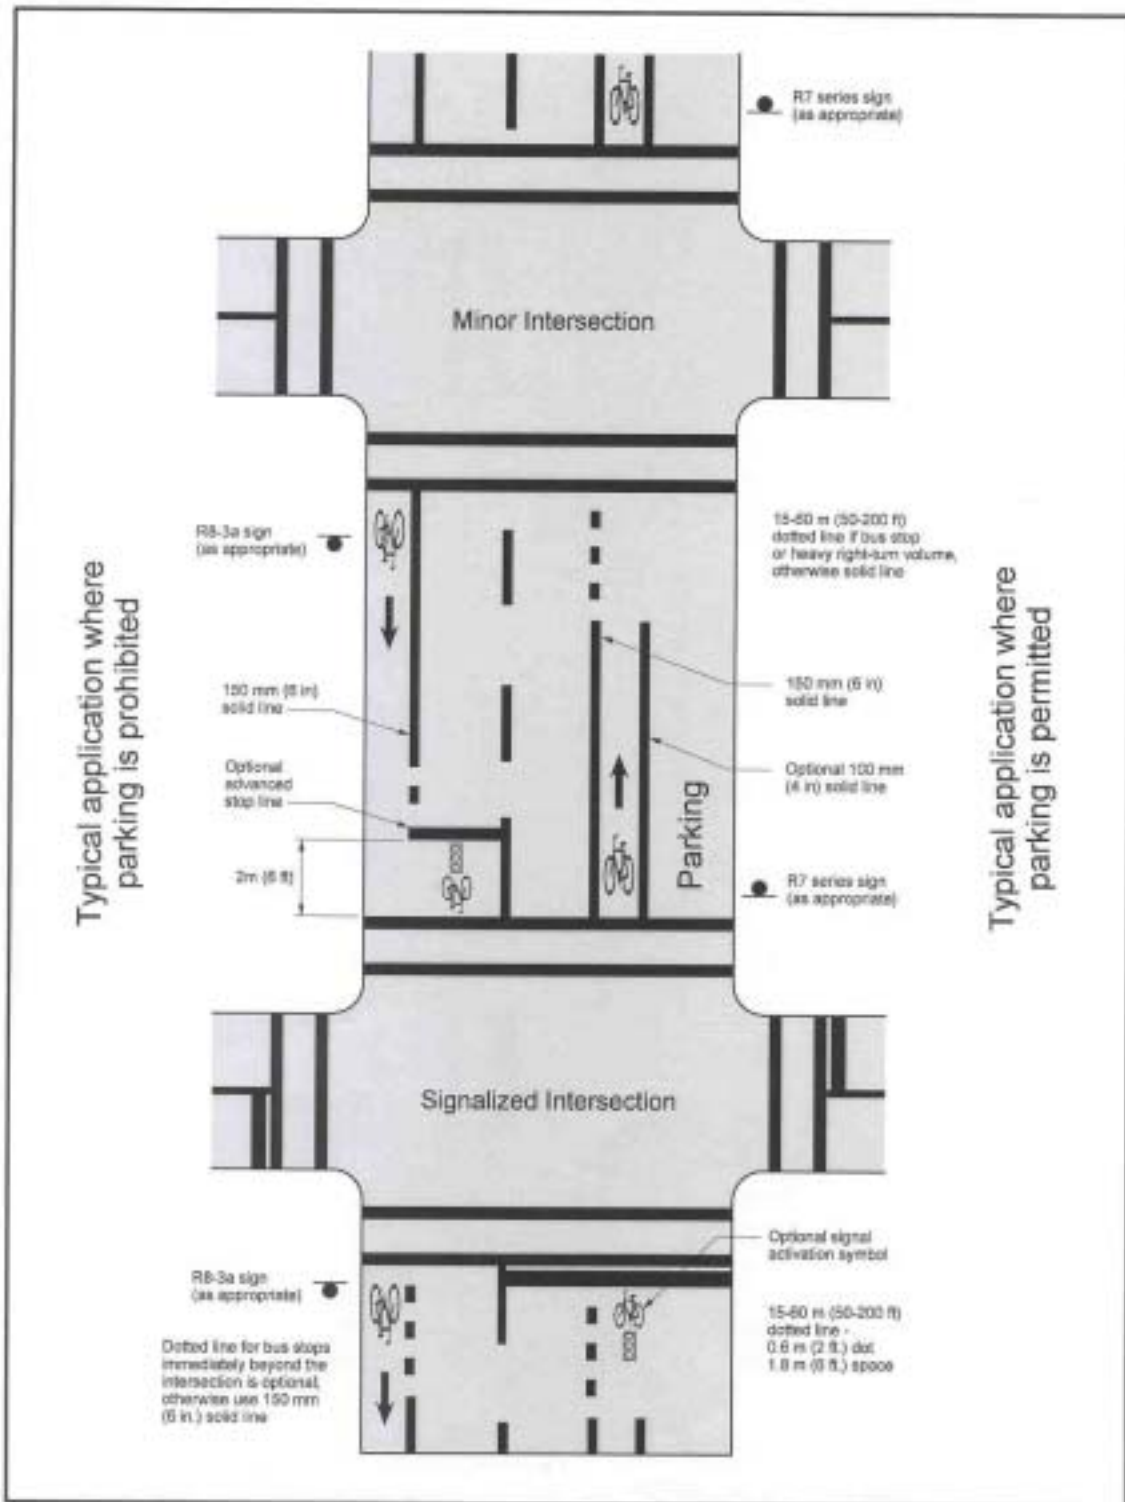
Typical Pavement Markings For Bike Lane On Two-Way Street
